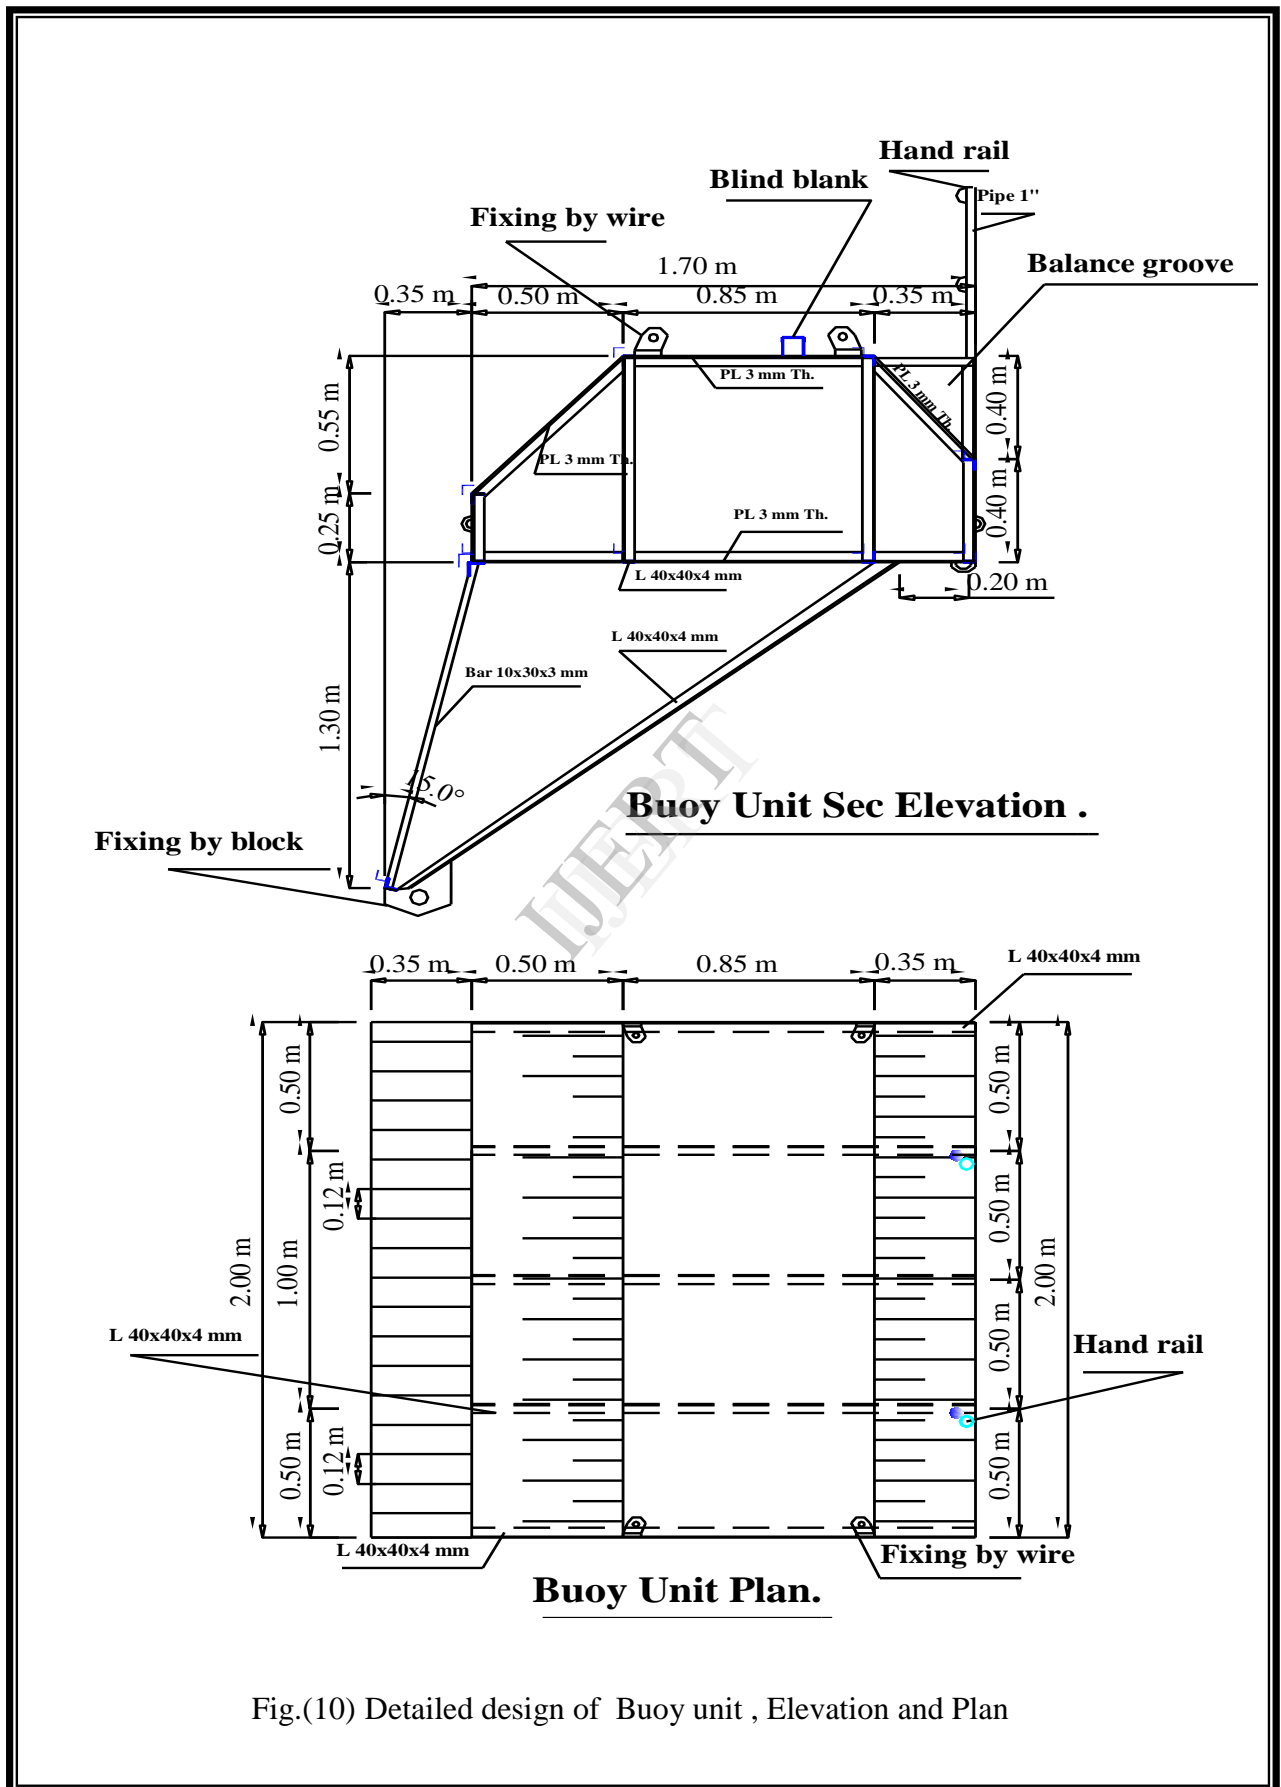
Detailed design of Buoy unit , Elevation and Plan
